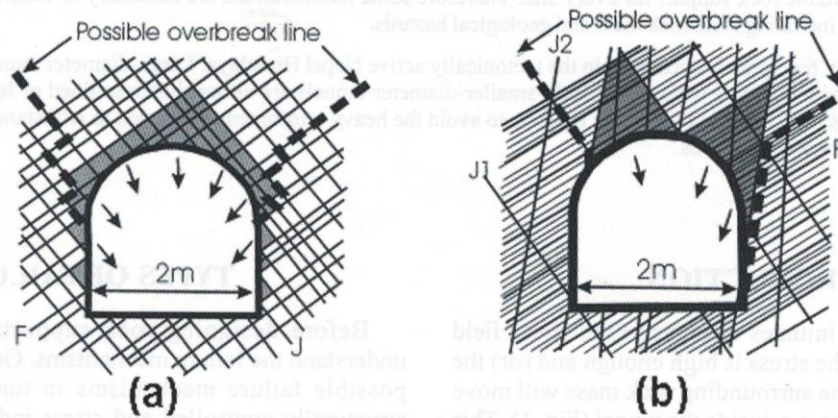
Typical structurally controlled failures shown by a dotted line and grey shading: (a). Structurally controlled shape of tunnel in widely and closely spaced jointed quartzite; (b). Wedge failures at the crown and wall controlled by joints in slate
